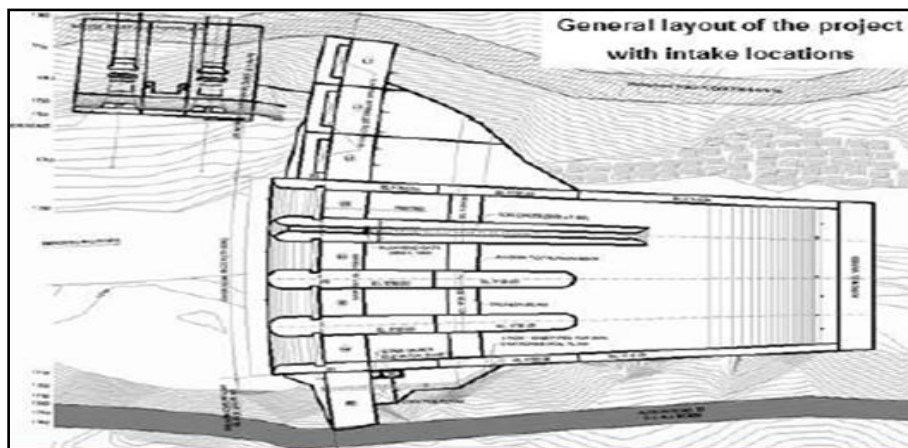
The figure shows the plan of general layout of power intake and the spillway. [2]
